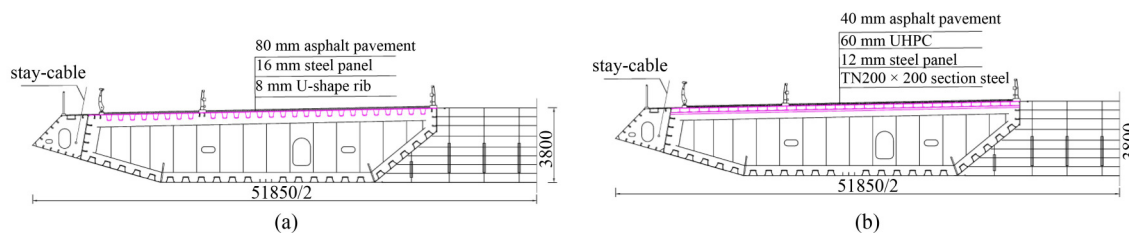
Standard cross section of steel girder (unit: mm): (a) OSD scheme; (b) SSD scheme.
